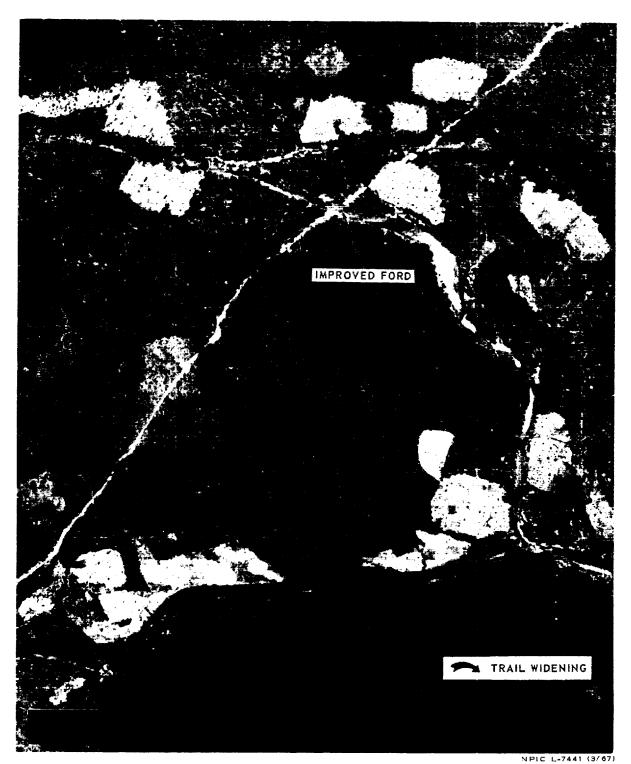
ROAD CONSTRUCTION (16-17N 107-13E), LAOS/SOUTH VIETNAM BORDER AREA
